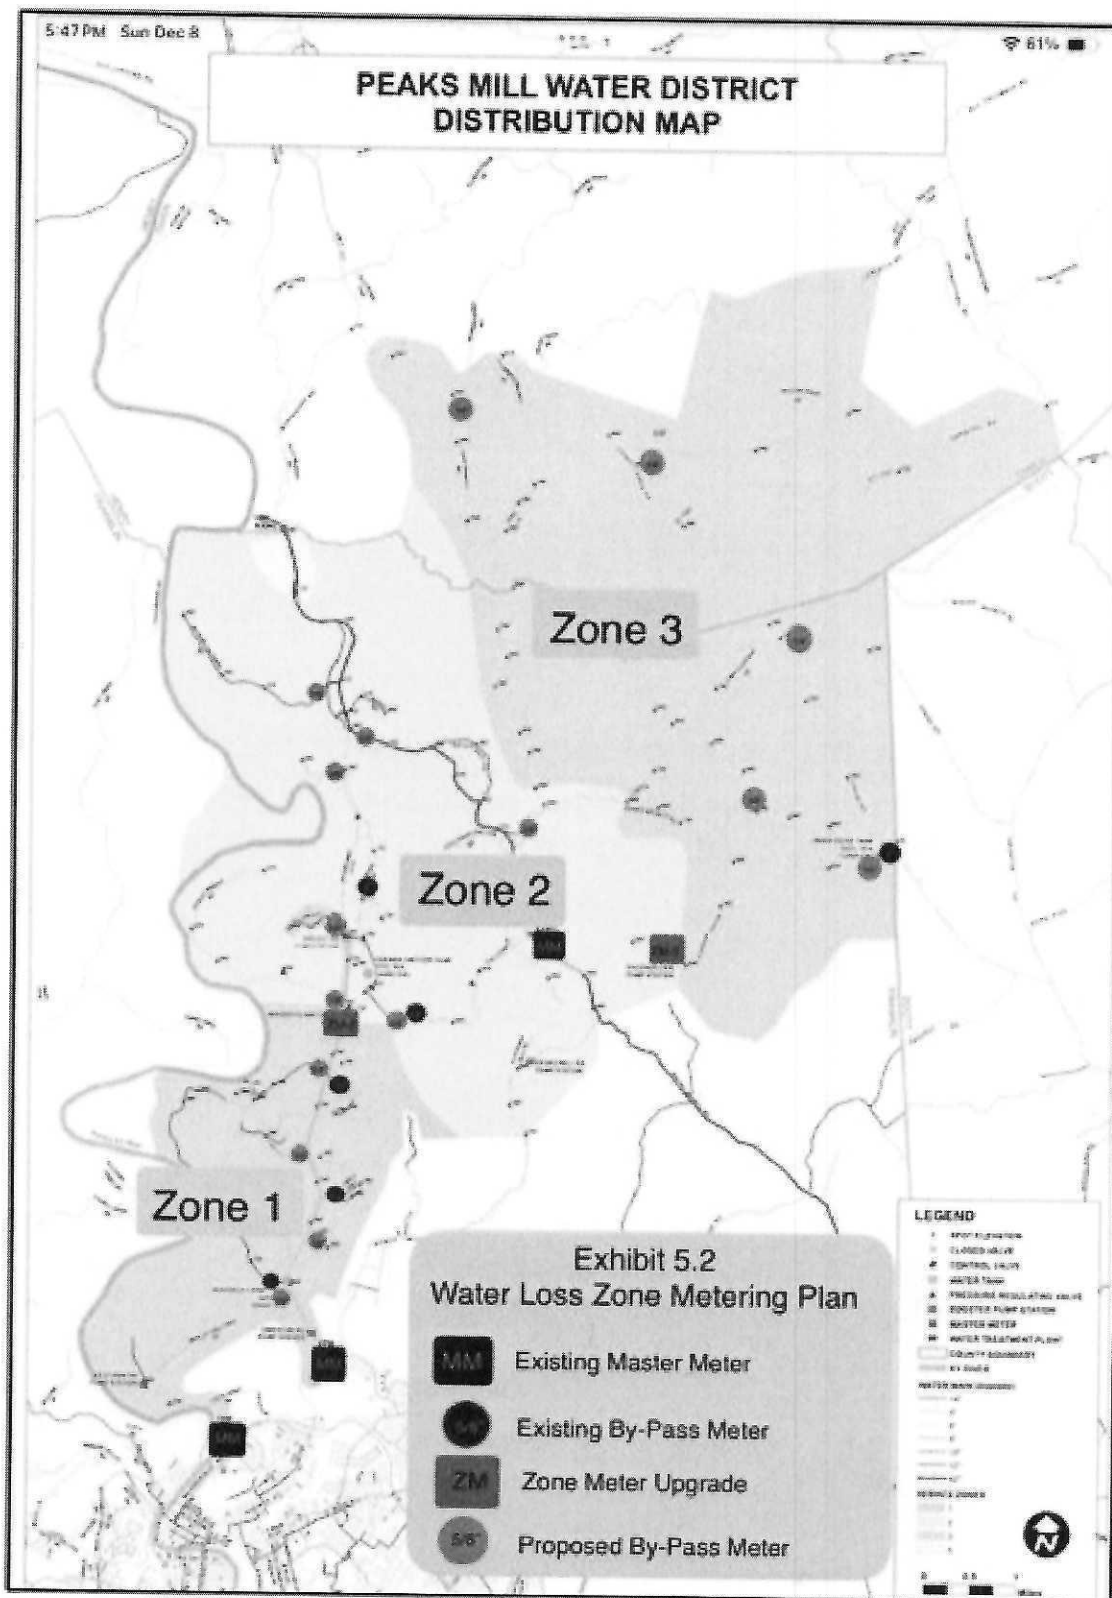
Proposed By-pass Meter Locations in QIIP and WLRP
